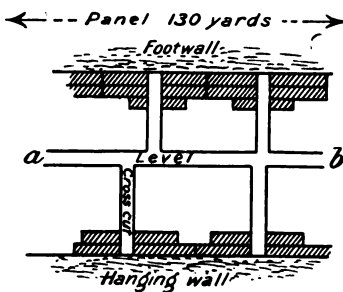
Plan of a Sub-Stage in working a Highly Inclined and very Thick Seam.
